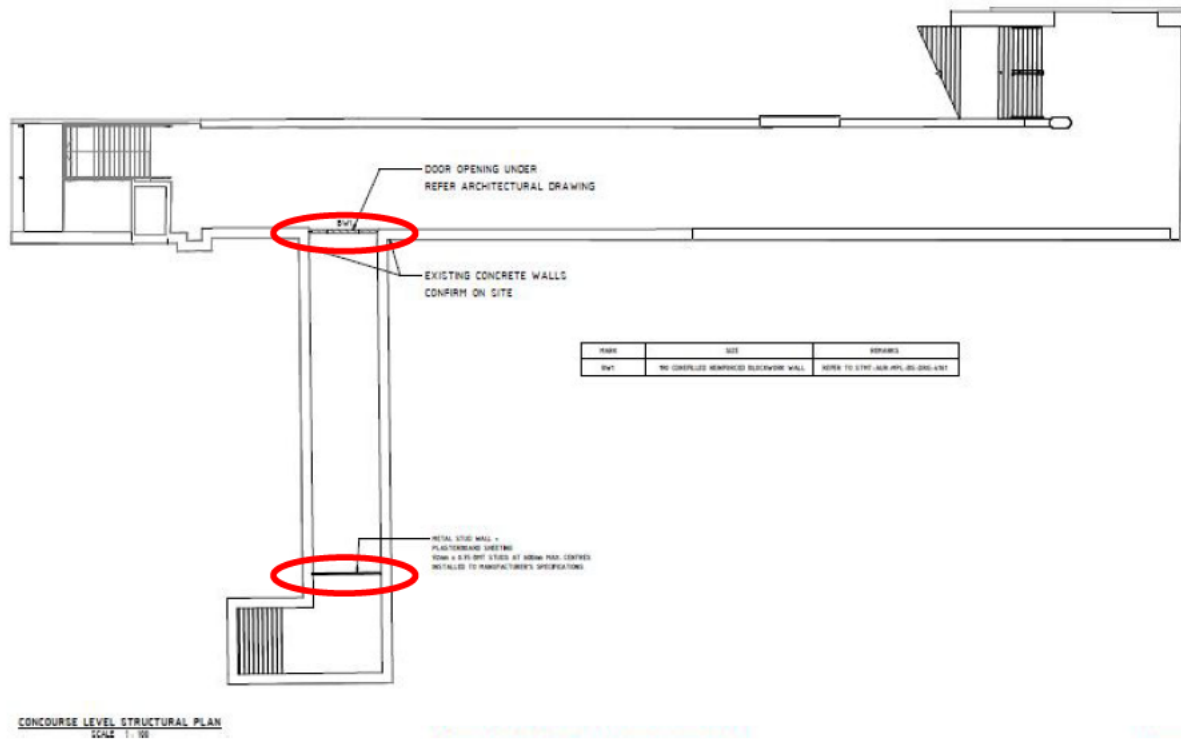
Location of proposed walls for new storeroom. Source: Transport for NSW 2024
